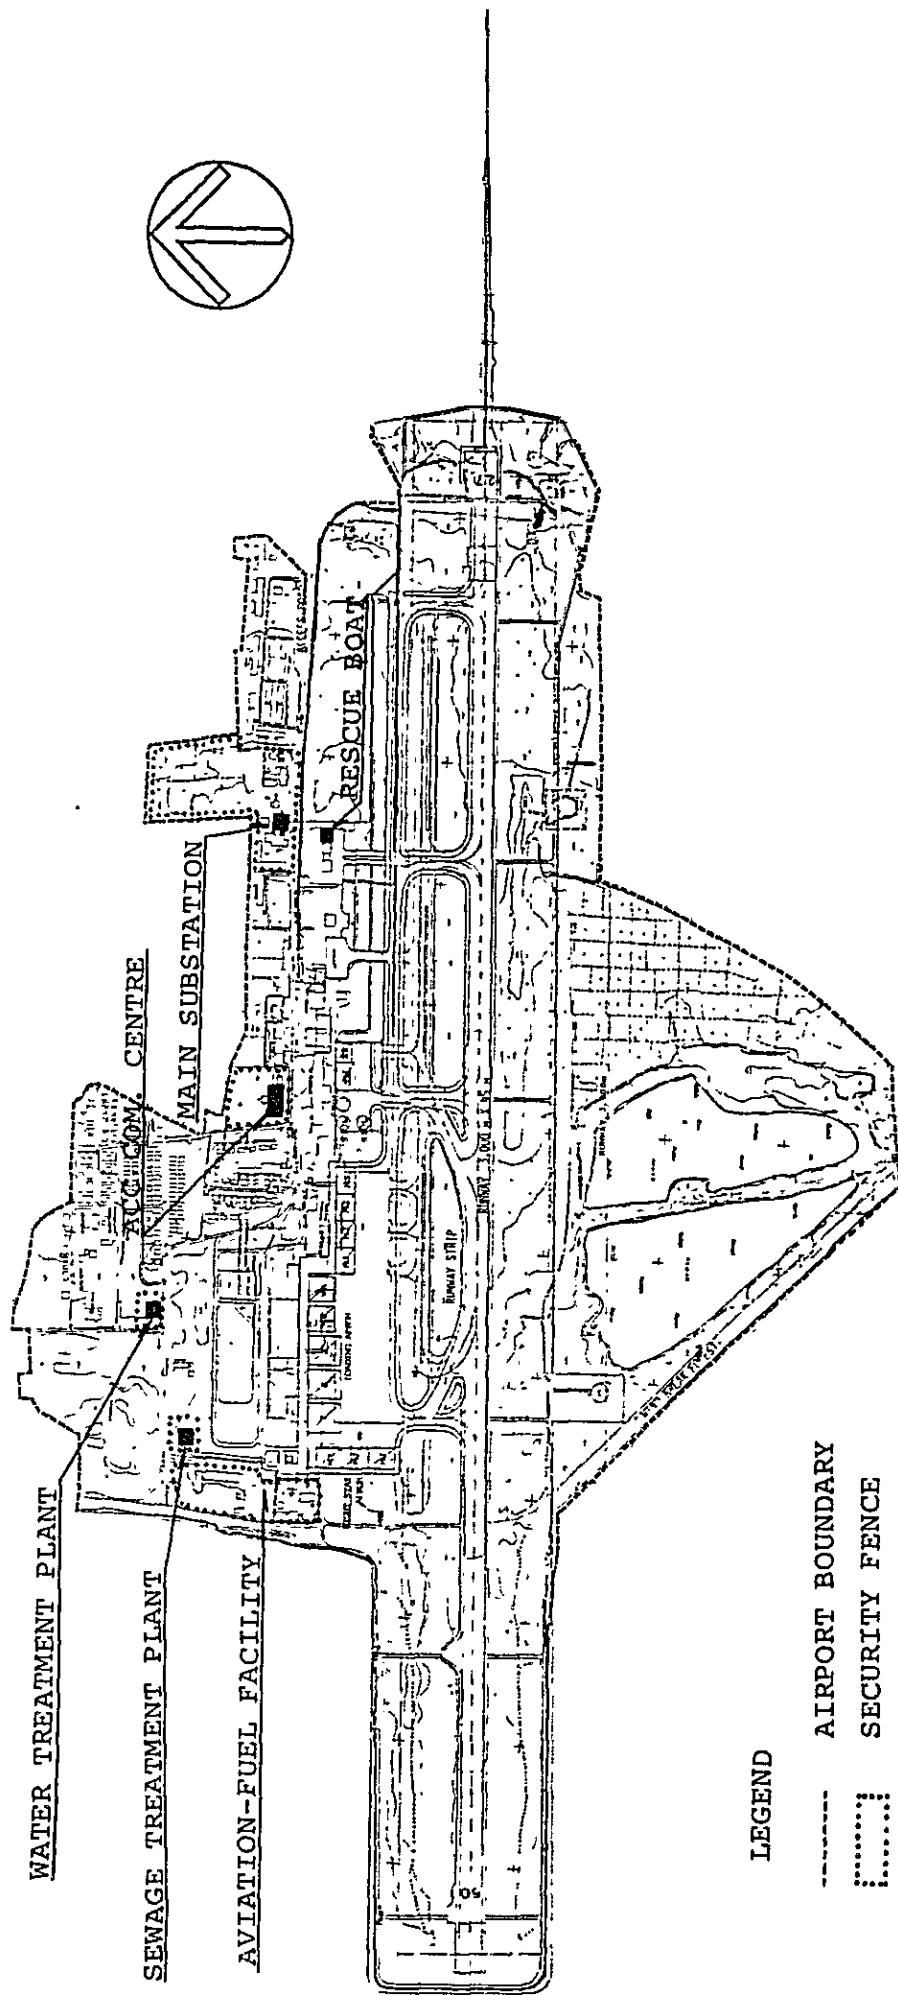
LAYOUT PLAN OF FUNDAMENTAL CLASSIFIED FACILITIES
